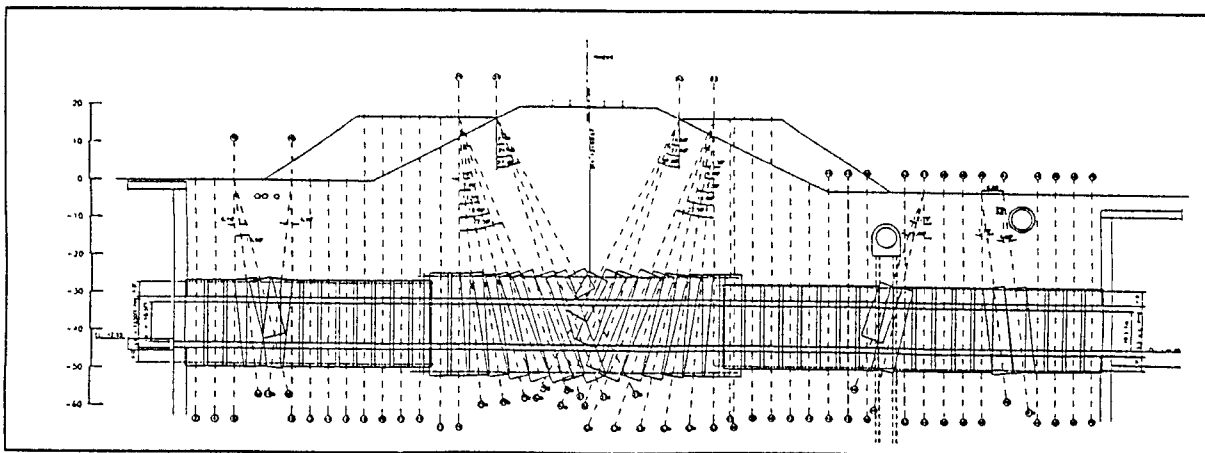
Cross section at Row C of jet grout columns under railroad tracks (Dimensions in feet; 1 foot = 0.3048m).
